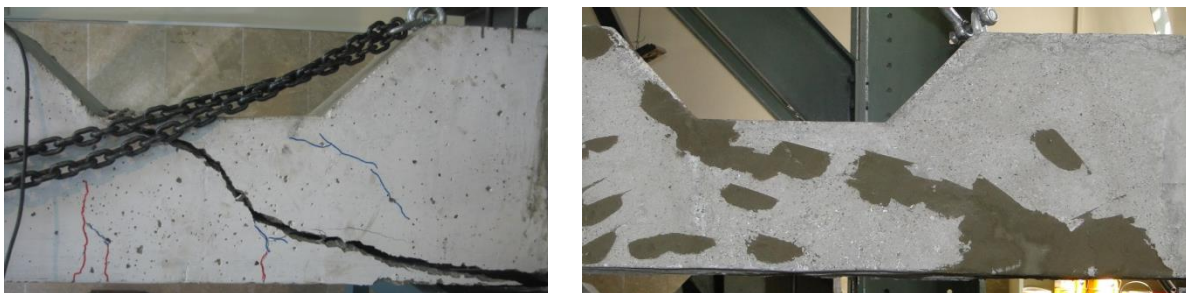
Cracking of $E0$ specimen and its repairing to prepare $E0R$ specimen
